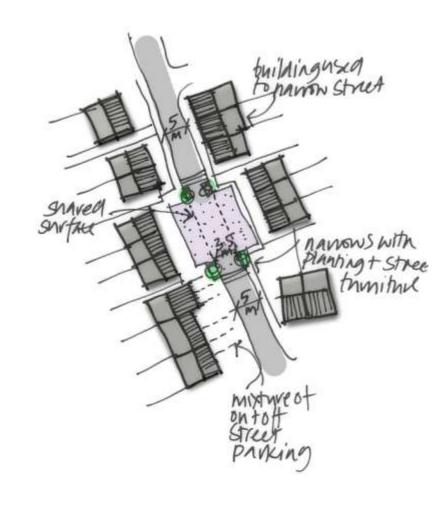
PRIMARY STREET INDICATIVE LAYOUT
